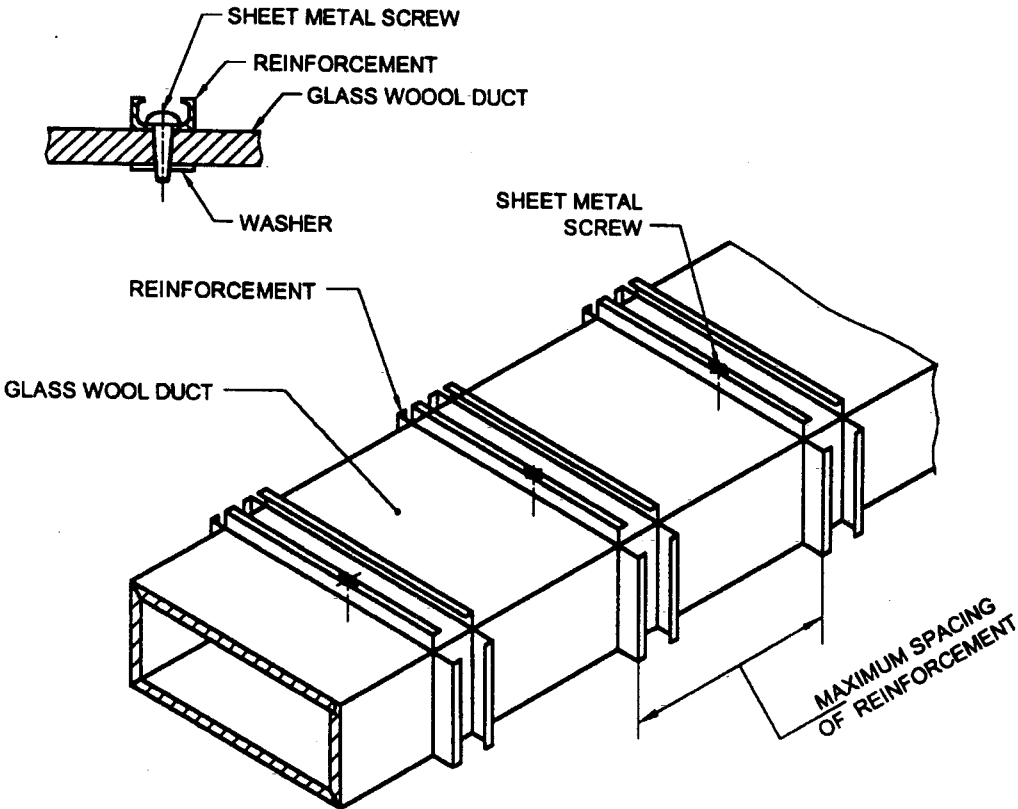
EXAMPLE OF REINFORCEMENT OF POSITIVE PRESSURE HORIZONTAL GLASS WOOL DUCT
